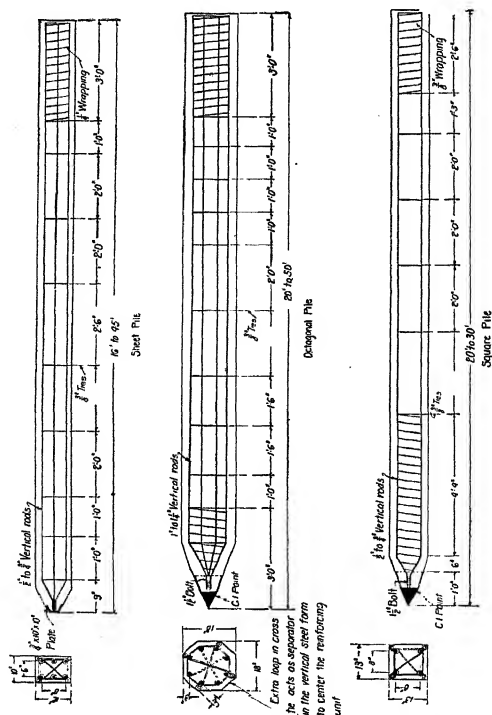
Details of piles used in ore-dock construction at Cleveland.
